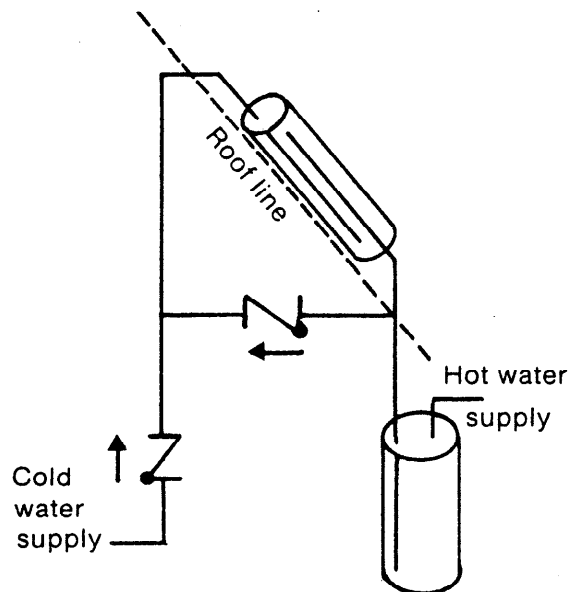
Plumbing Arrangement to Help Protect Outdoor Pipes from Freezing
